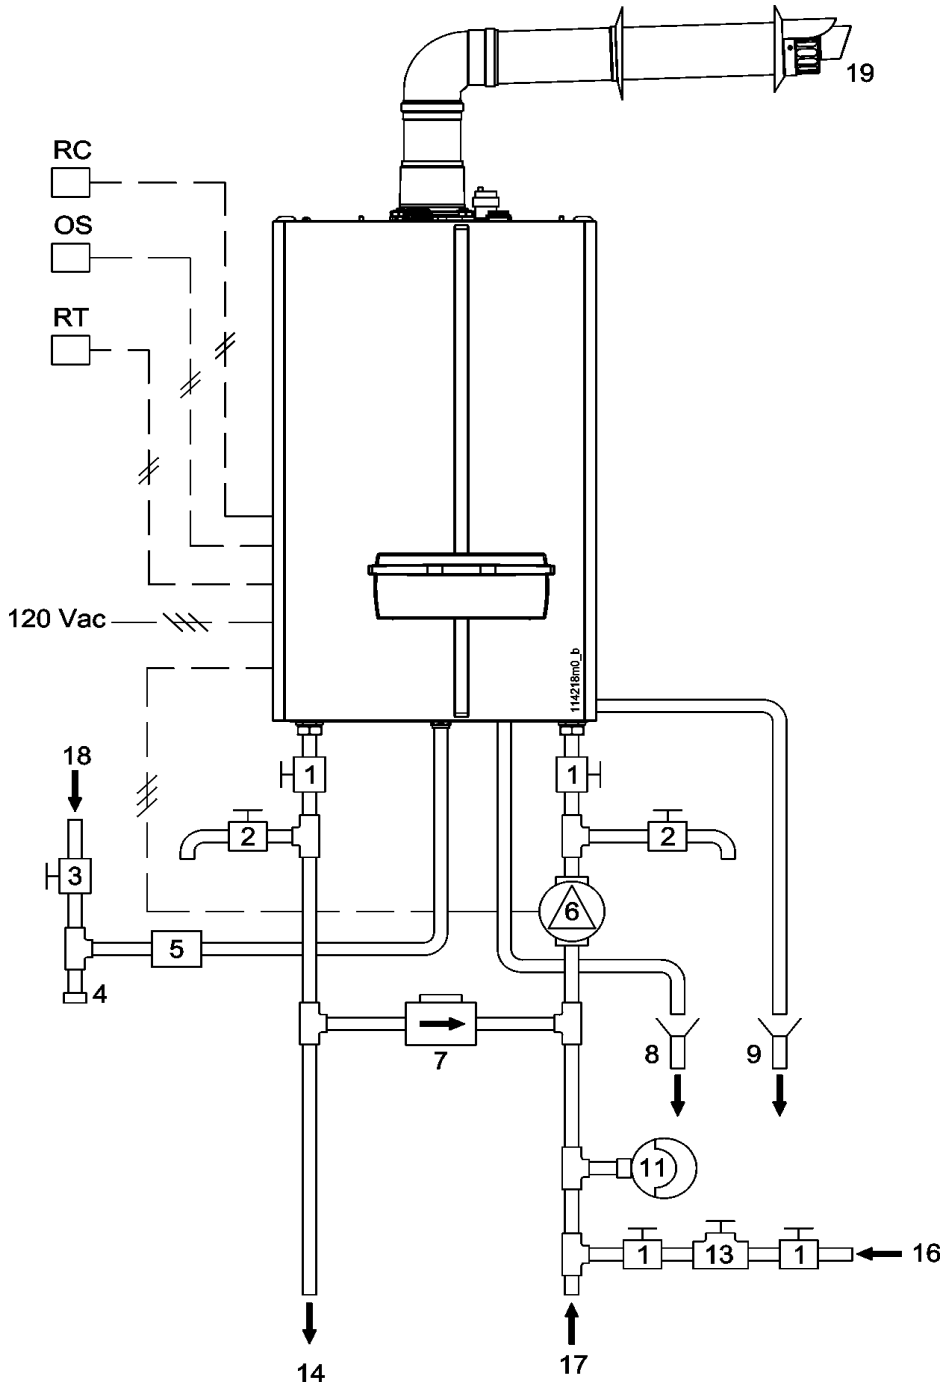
Typical piping and wiring connections for a boiler models 160C and 160OC
